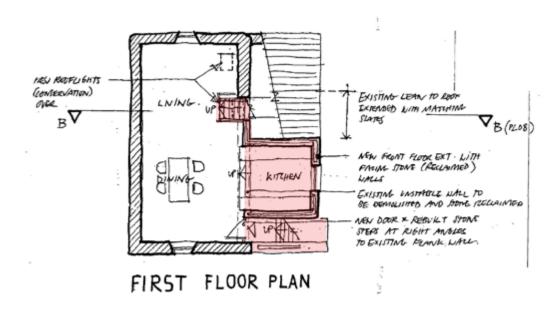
The Old Stables Manor Farm Proposed First Floor Plan
